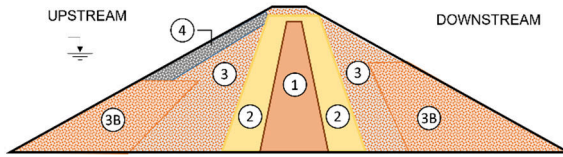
Typical cross-section of an embankment dam with an impervious core.
